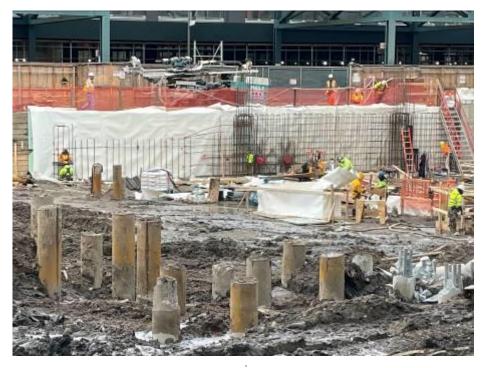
ECD installing rebar over previously installed vapor barrier (facing northwest).
